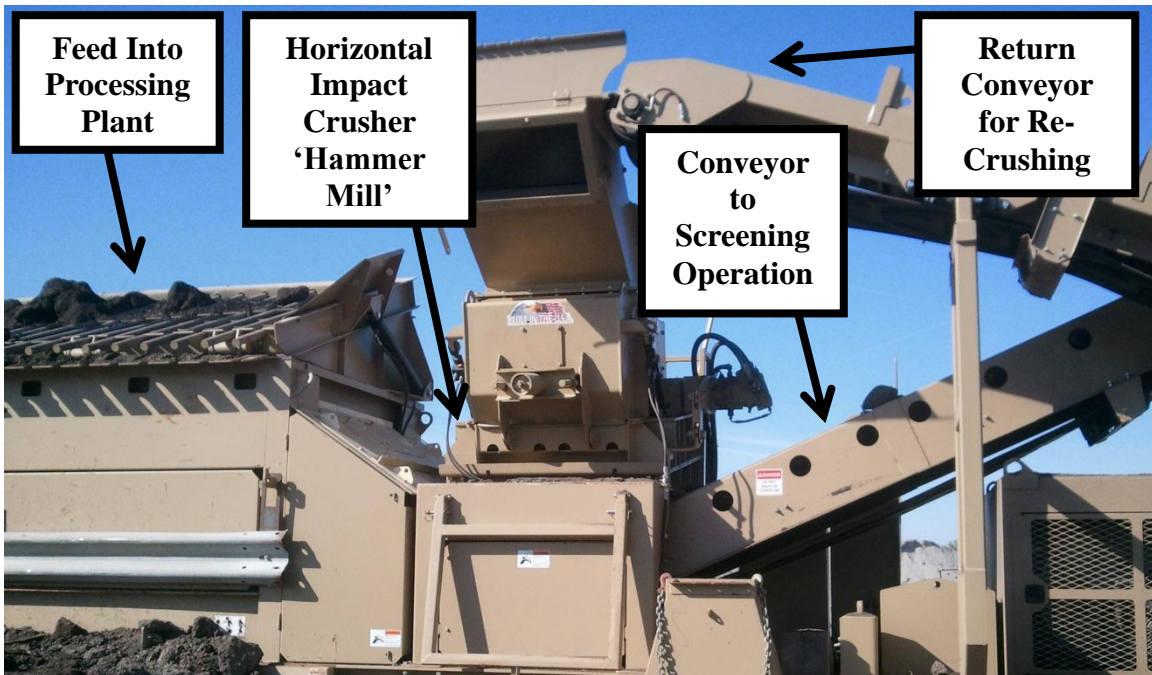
RAP Processing Equipment - Hammer Mill Crusher
